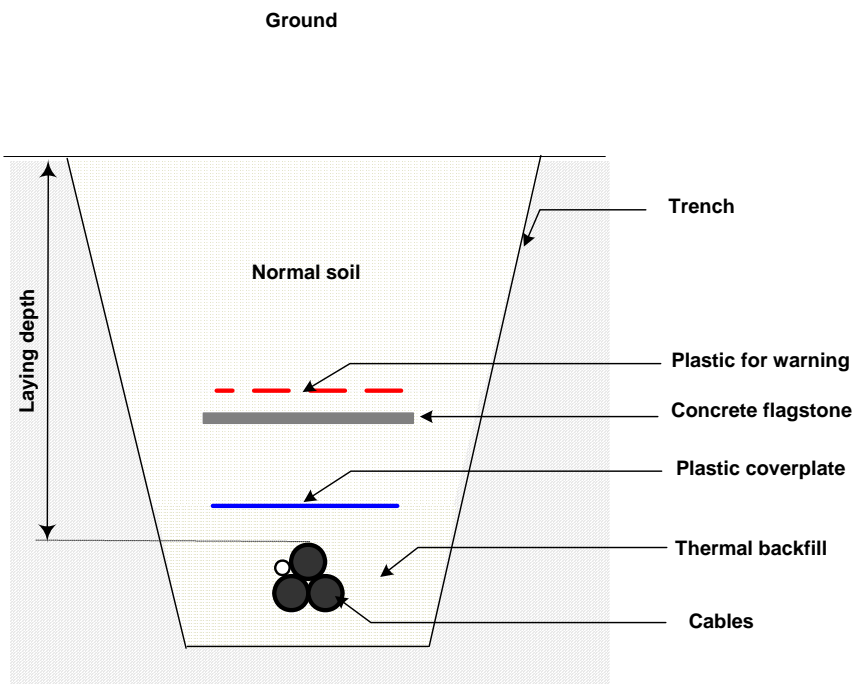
Drawing illustrating minor depth but protection with concrete flagstones or metal cover plate
